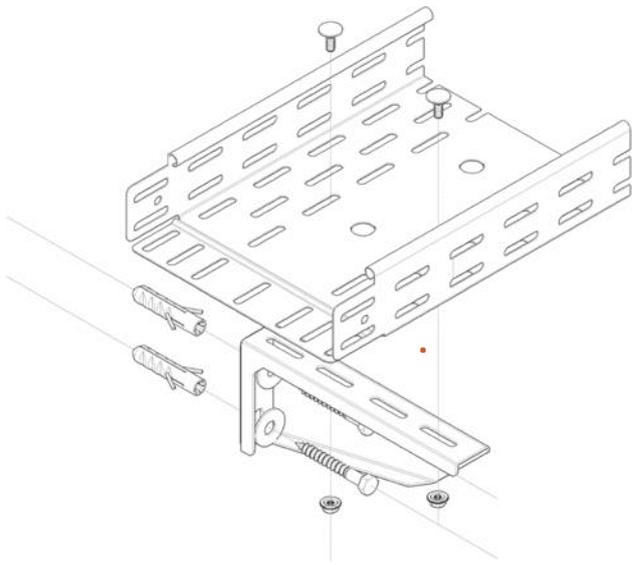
Example of the installation of the cable tray onto the wall with the curved SNT wall bracket or welded SNV bracket
